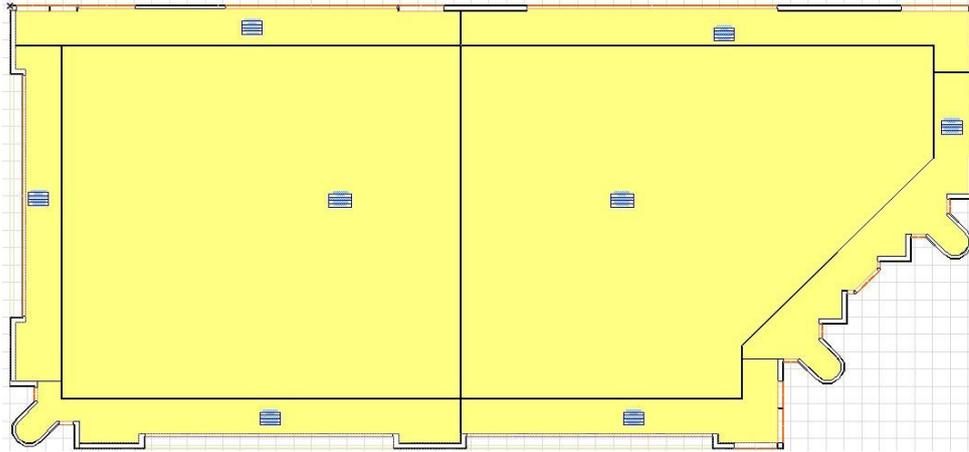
Typical zoning strategy - first floor plan from the initial model (revision 1)
